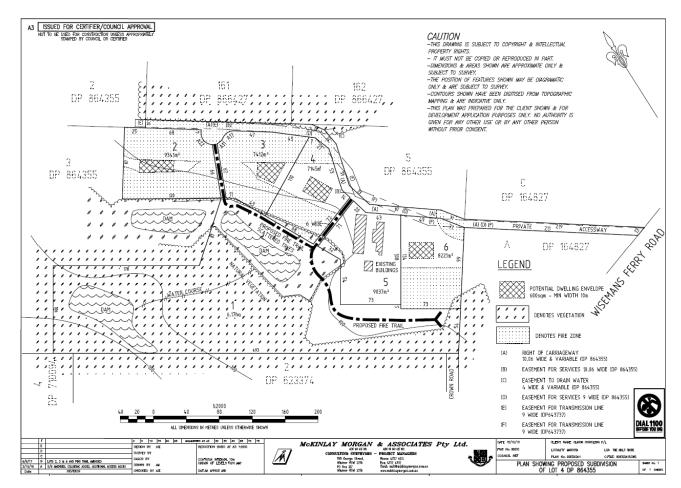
Extract from the proposed subdivision plan prepared by McKinlay Morgan & Associates (Plan No. 92830: DA:1, dated 12/10/15 REV: B 6/9/17)
